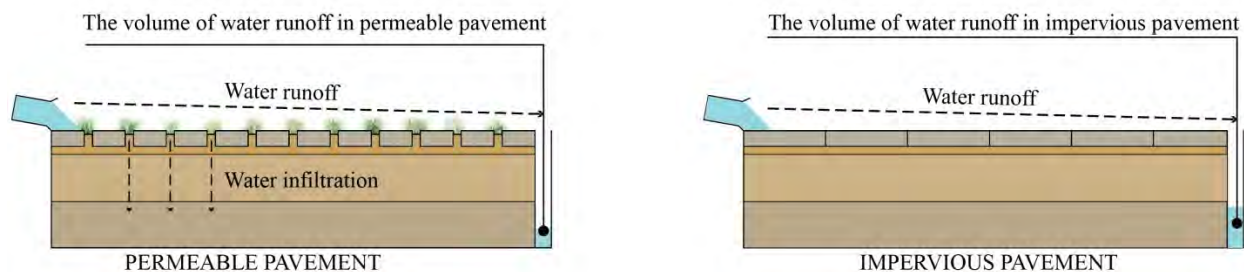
Get water sample to test stormwater runoff in permeable pavement and impervious pavement
